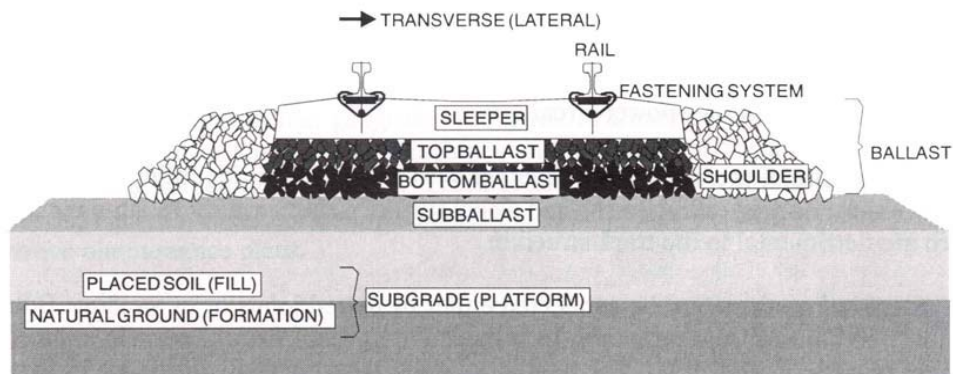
Typical ballasted railway track cross section (after Selig and Waters 1994)
